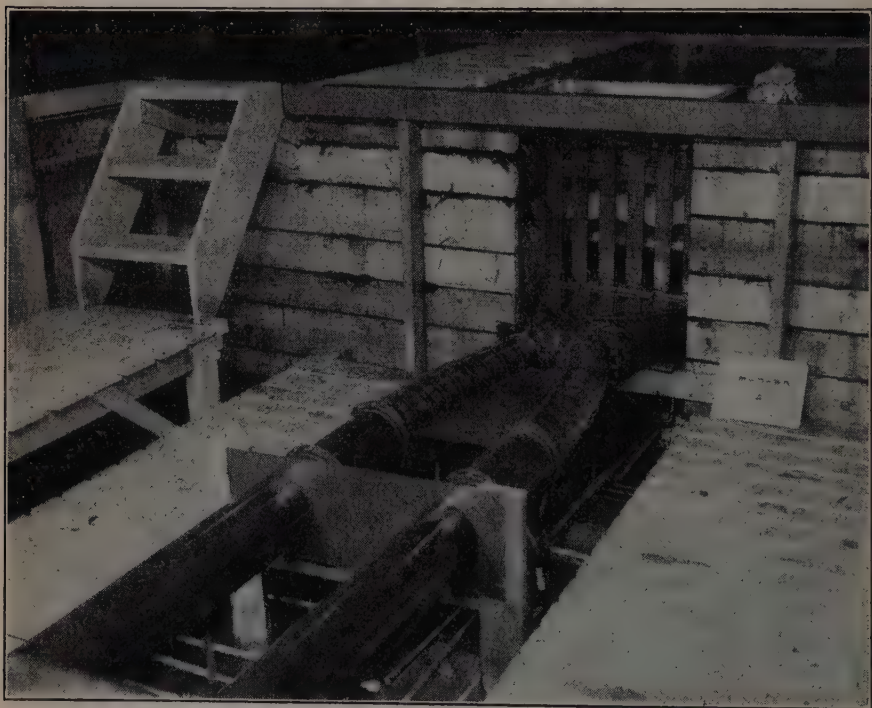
MODEL OF INTAKE AND TWIN TUNNELS, MOHAWK DAM
